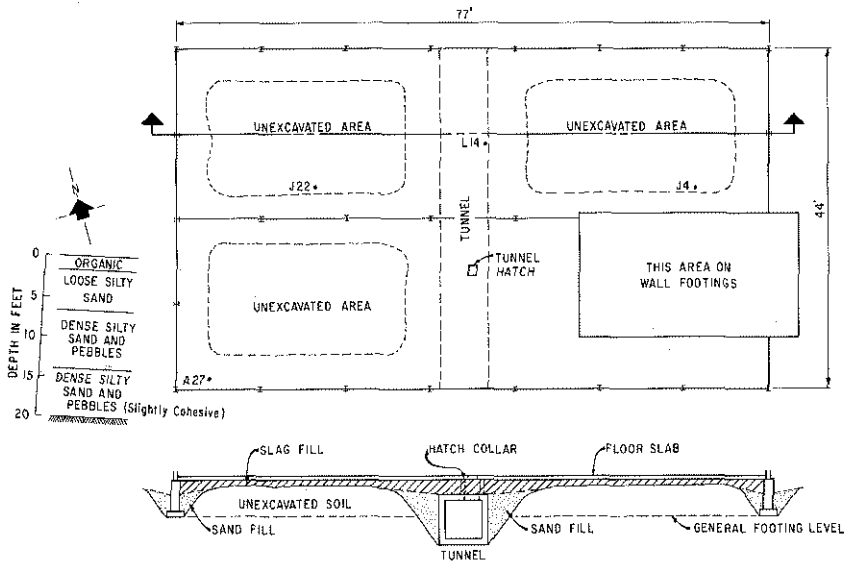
PLAN OF BUILDING AND SECTION THROUGH FOUNDATIONS SHOWING UNEXCAVATED AREAS AND DISTRIBUTION OF SLAG FILL BENEATH FLOOR SLAB
